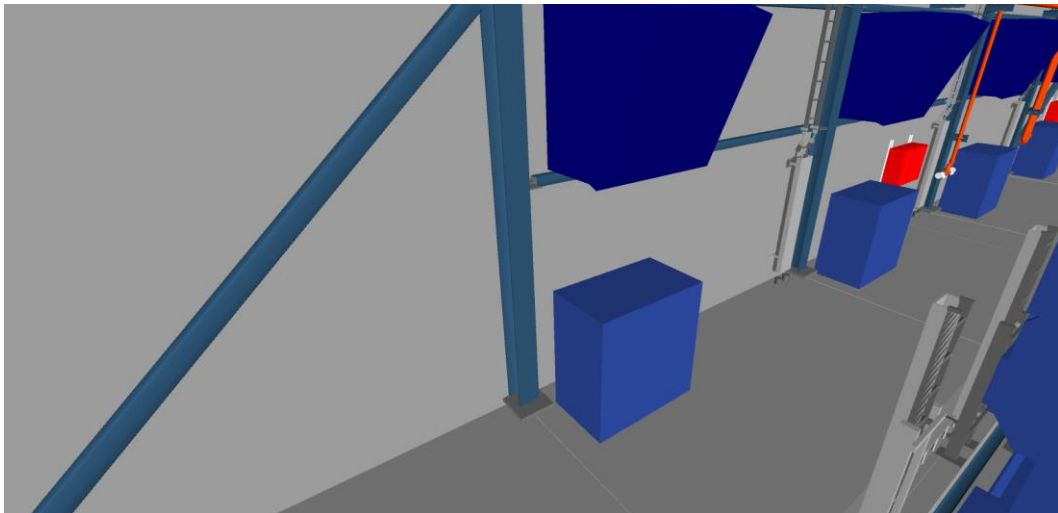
Case 2: neutral point cubicle installed next to the back wall in a project with W34 engines.
